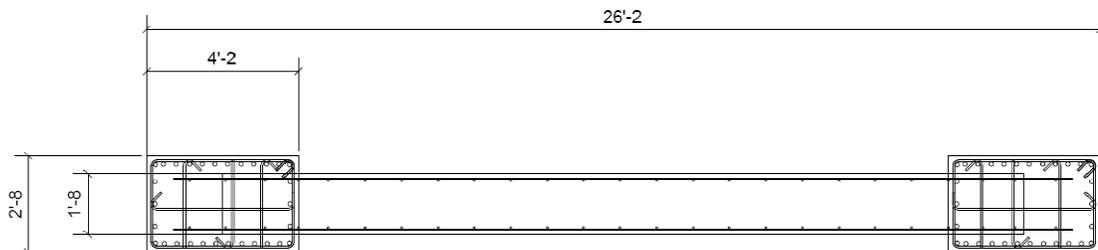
Plan view of the design shear wall (redrawn from Nawy 2000)
